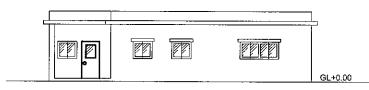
Transfer Station in Homs, Truck-Scale Building & Guard House
